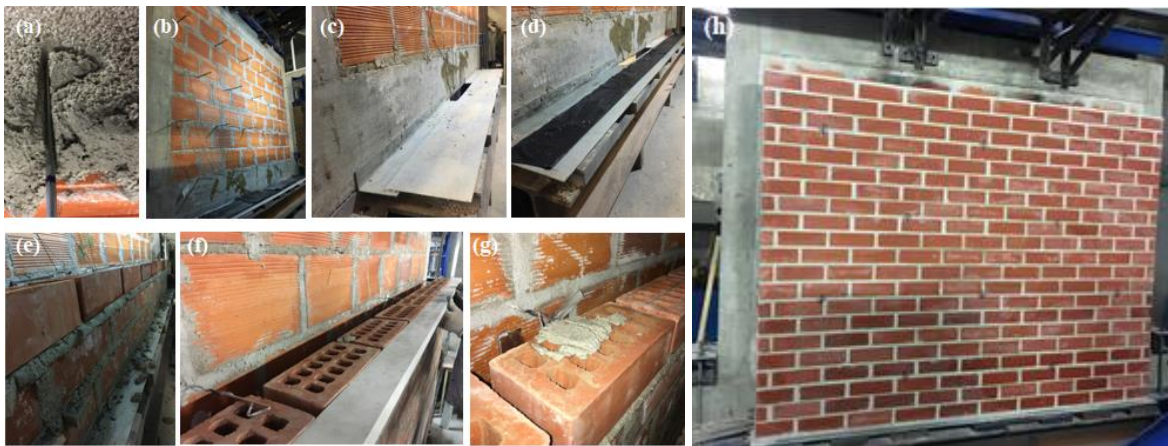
Specimen construction detailing: (a) wall tie embedment on infill leaf; (b) previous construction of infill wall; (c) shelf angle without and (d) with flashing; (e) construction of veneer wall; (f) alignment of the connectors and (g) wall tie embedment on veneer leaf (h) global view of specimen
